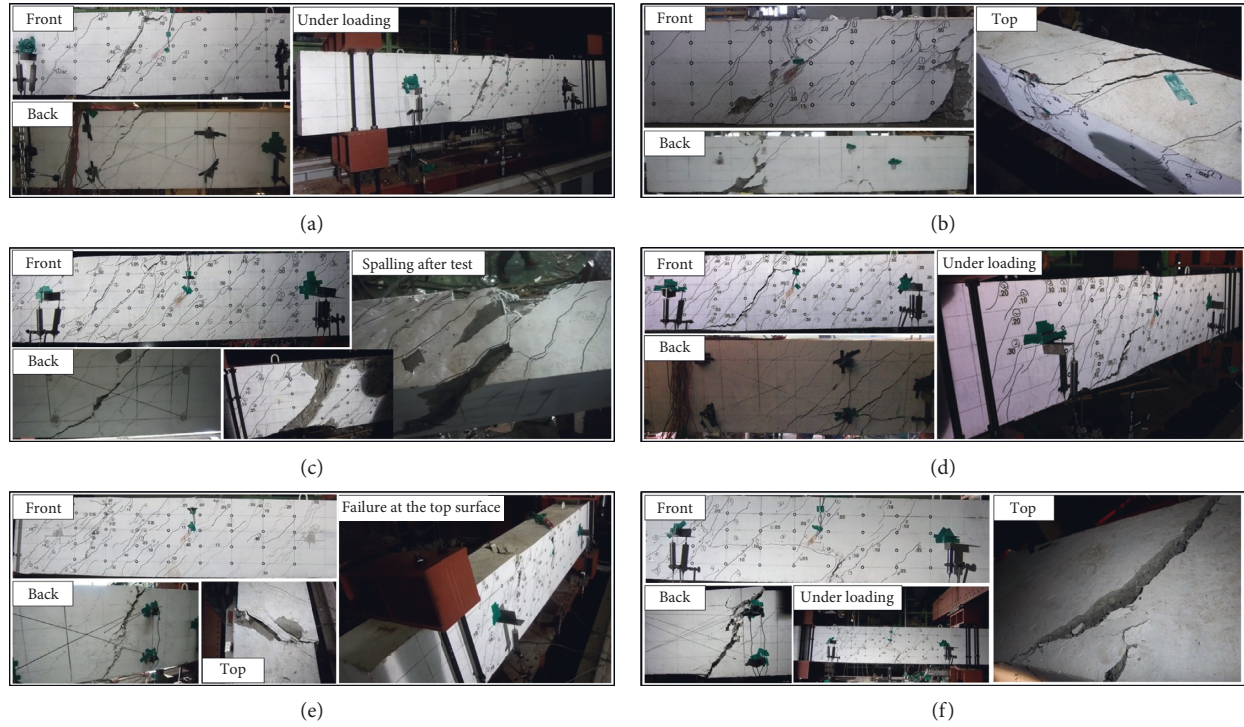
Crack pattern and failure of specimens: (a) MT30-0.77; (b) MT30-1.32; (c) MT40-1.32; (d) MT40-1.89; (e) MTF25-0.77; (f) MTF25-N.
